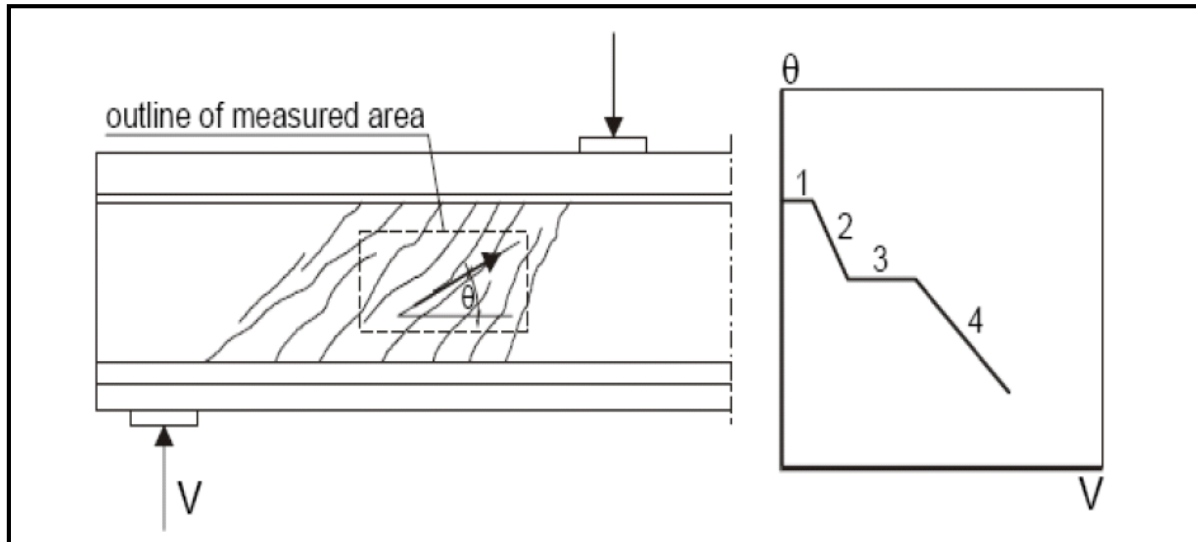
Schematic representation of the rotation of the concrete struts as measured on the web of beams with shear reinforcement (European Concrete Platform, 2008)
